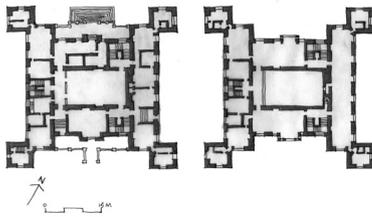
Robert Smythson, Wollaton Hall, Plans. Author
